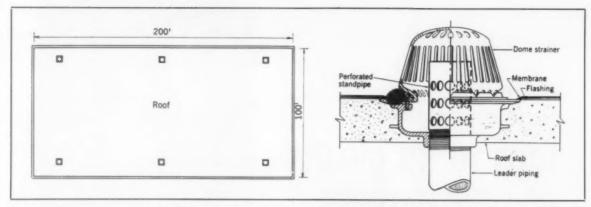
(left). Typical arrangement of roof drains to afford complete drainage. Fig. 2 (right). Modification to roof drain to provide retarded flow
